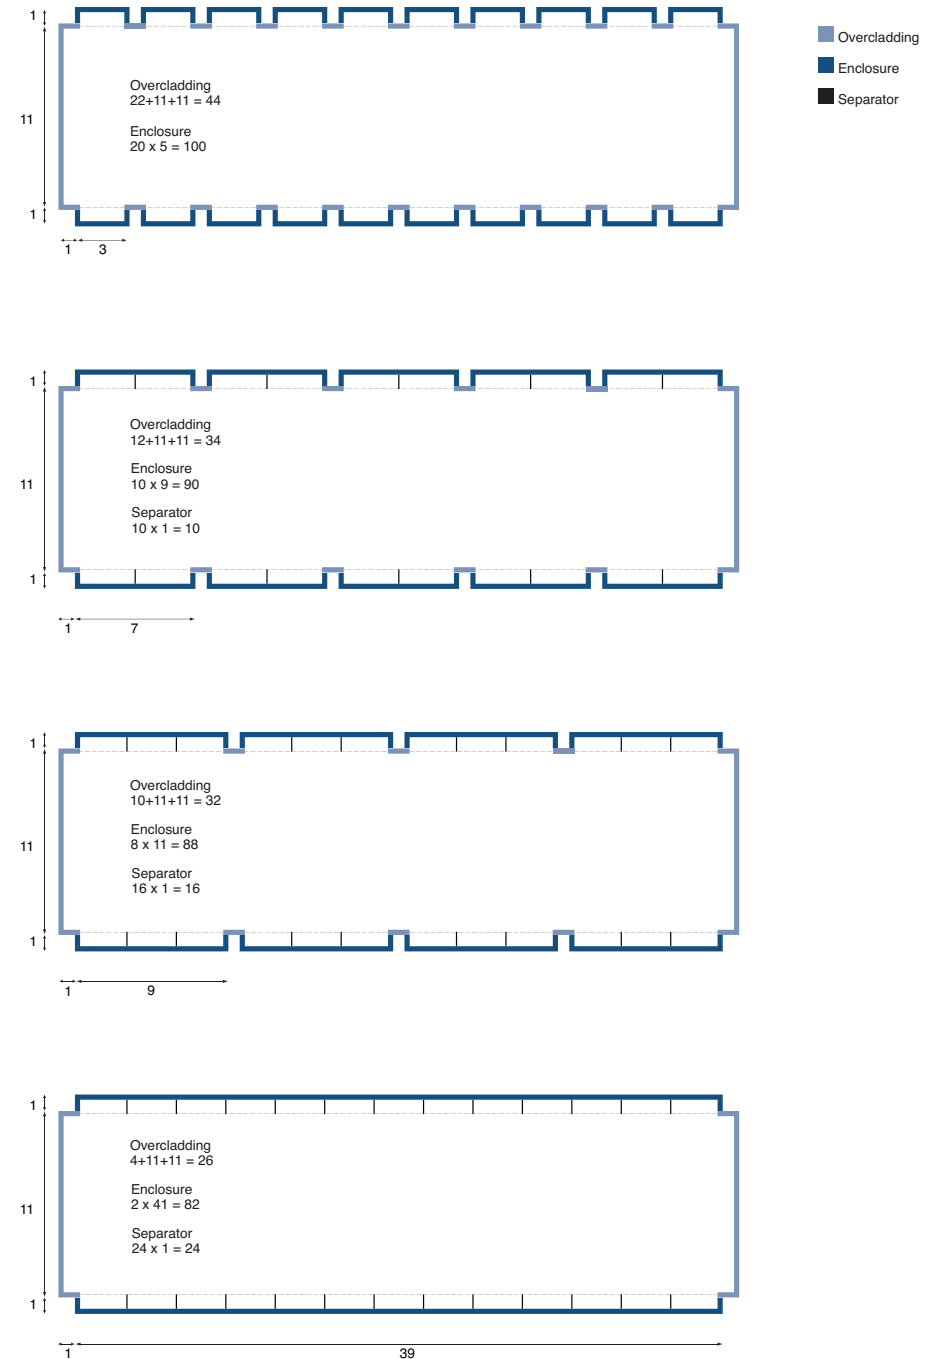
Parametric analysis of wall overcladding to balcony enclosure ratio for a typical tower building.
